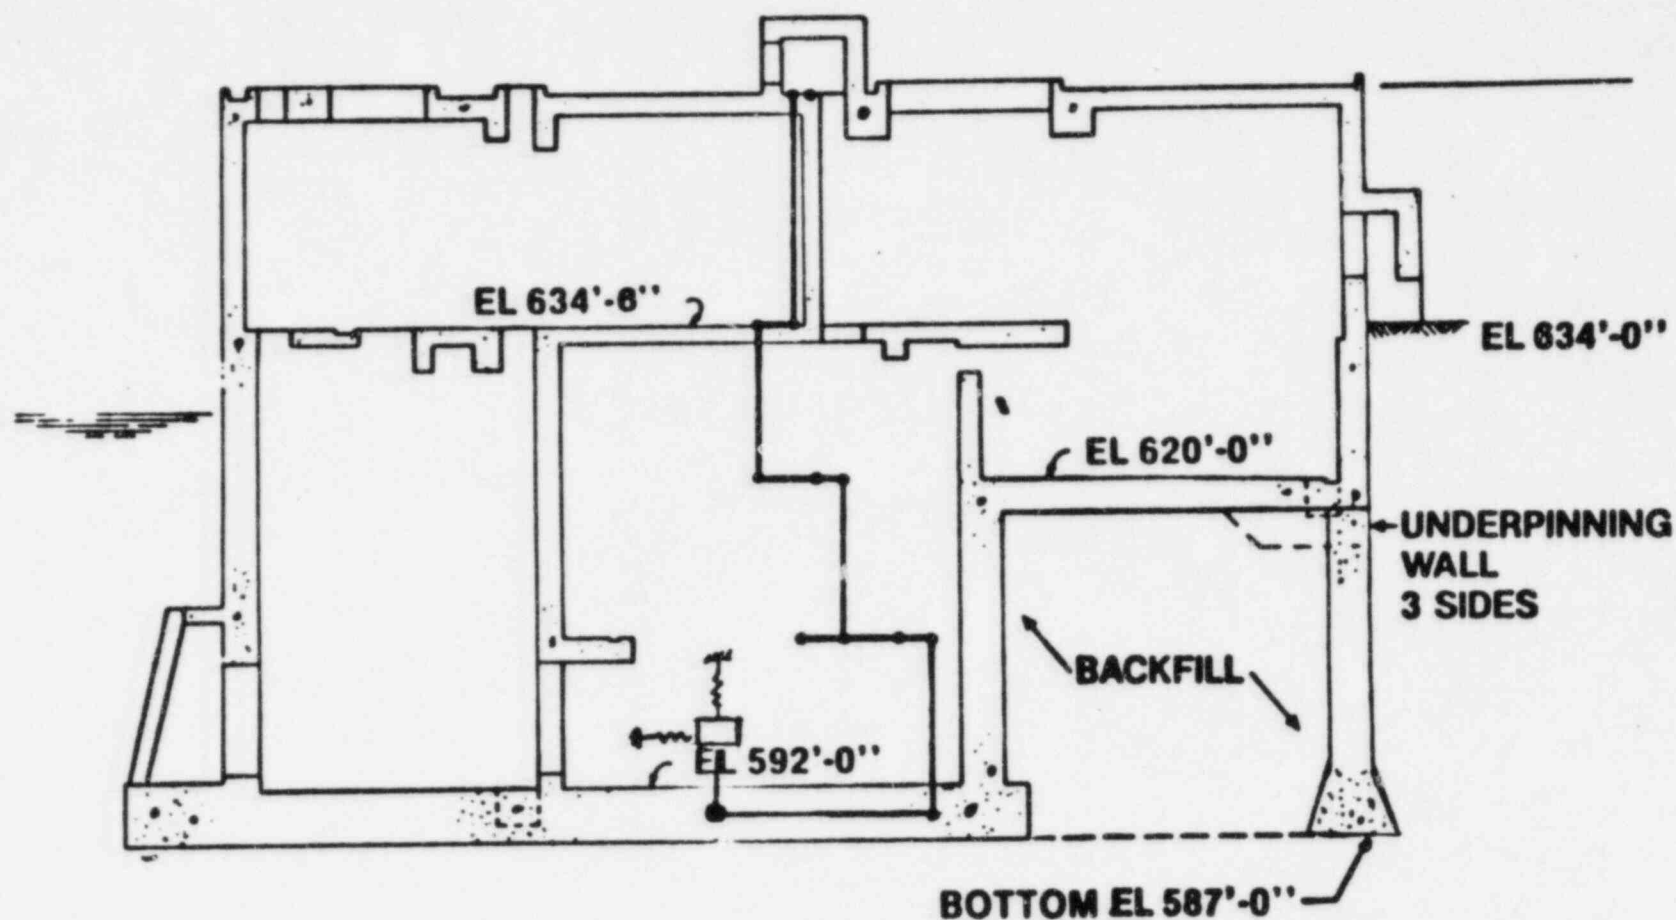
SERVICE WATER PUMP STRUCTURE NORTH-SOUTH SECTION
